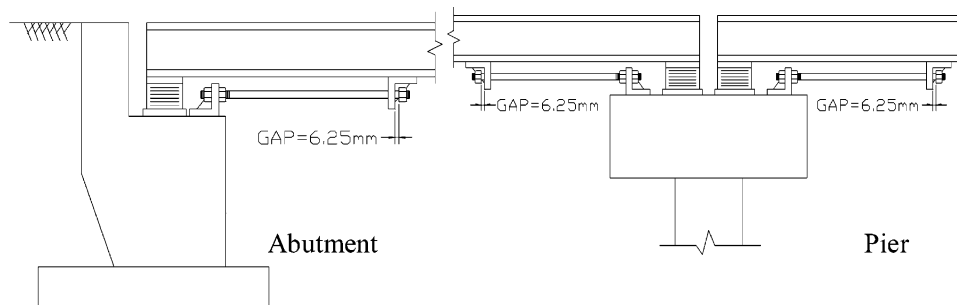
Configuration of shape memory alloy restrainer bar used in multi-span simply supported bridge at abutments and intermediate piers.
